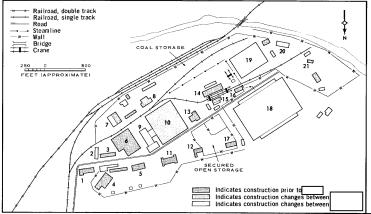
LAYOUT OF LENINGRAD AIRFRAME PLANT 458.
